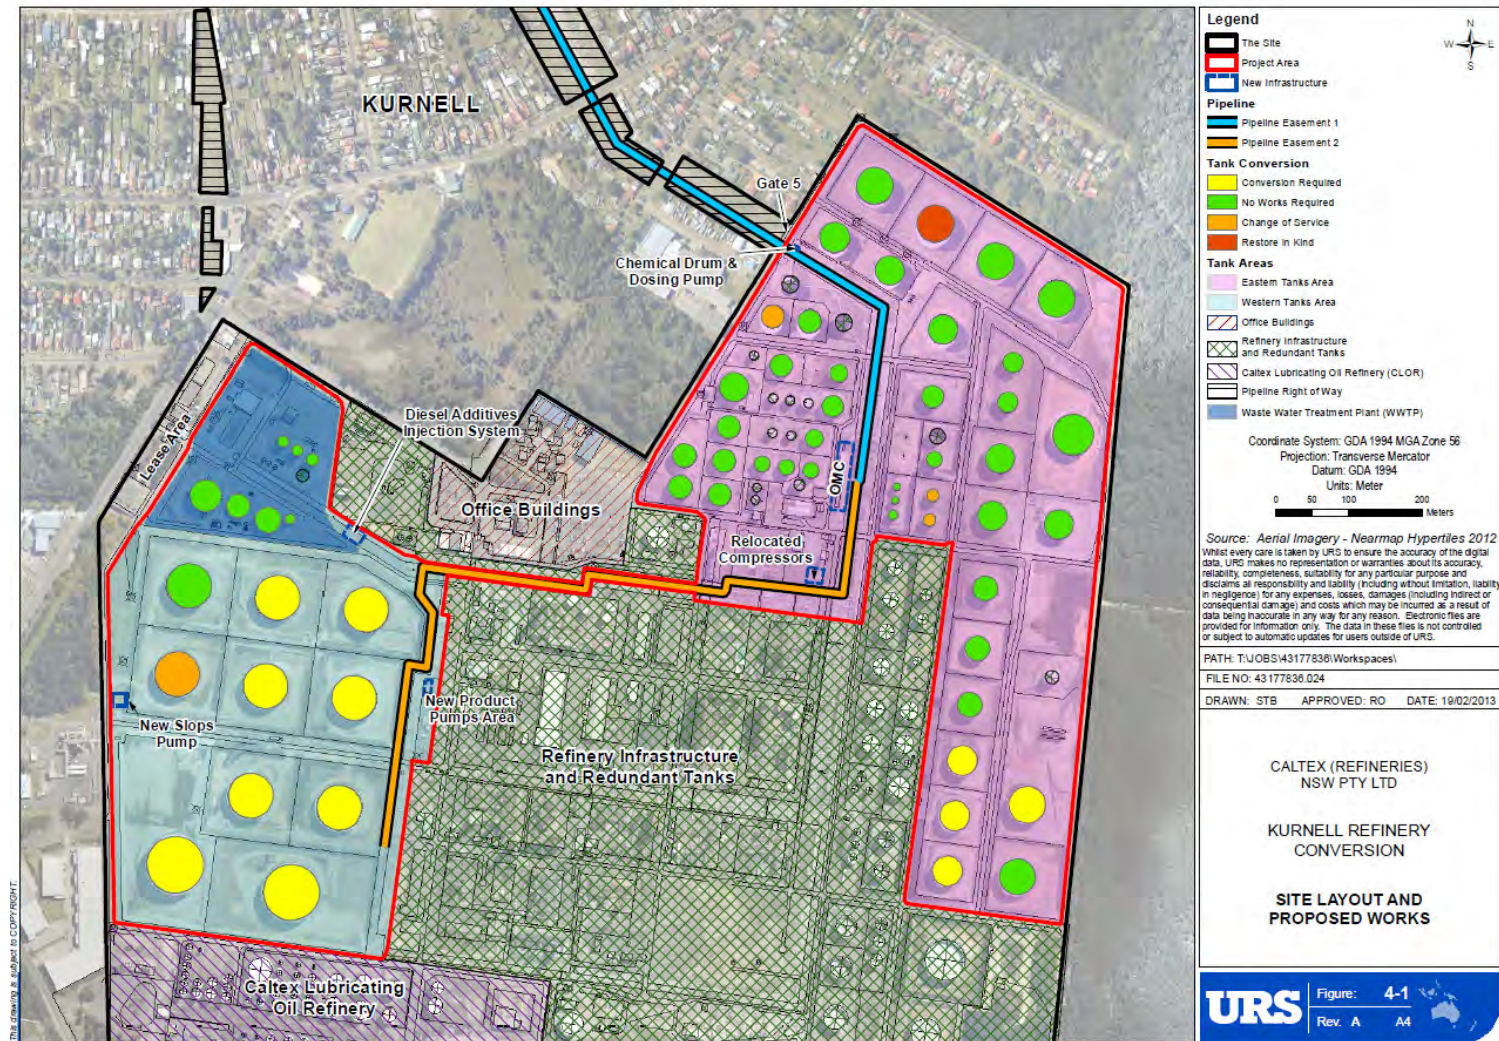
Site Layout and Proposed Works (Source: URS, EIS Figure 4-1).
